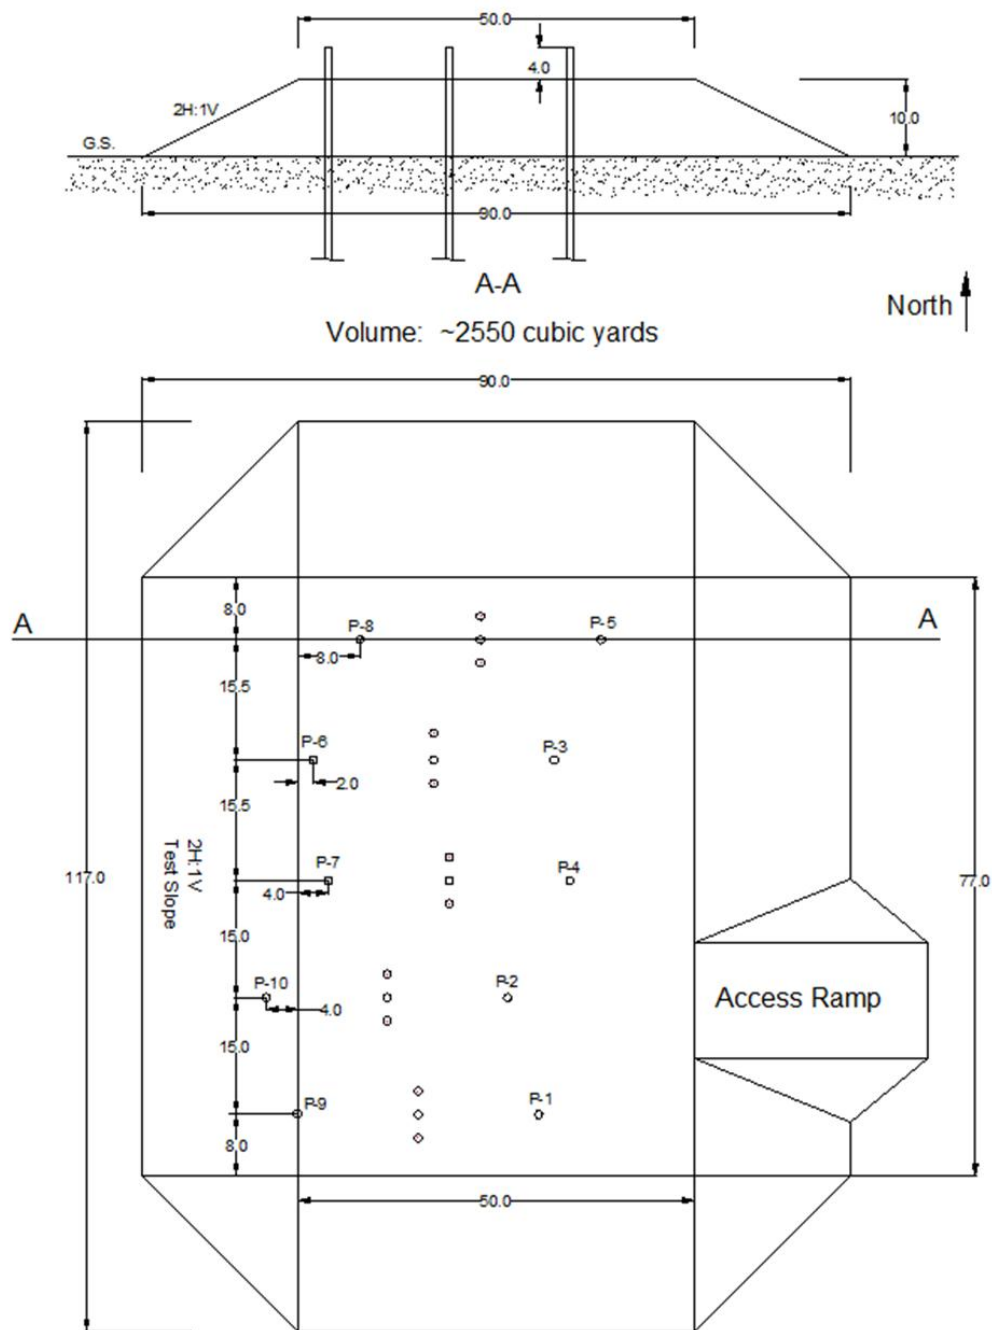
Plan and cross-sectional views of cohesionless embankment
